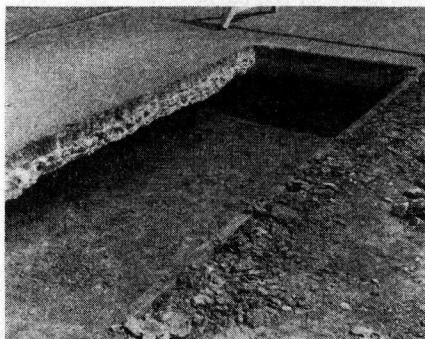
Old pavement and subgrade removed. Slab was under-cut to allow spreading of foundation. Note type of subgrade material—a tough, plastic clay of the Iredell Series.
